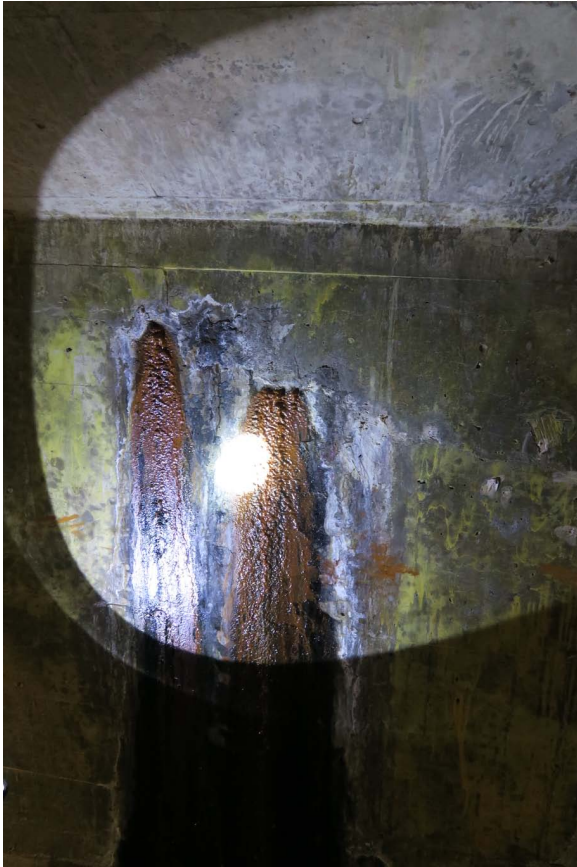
material seeping into outlet conduit at CH 62 (as measured from inside face of outlet tower in downstream direction).
